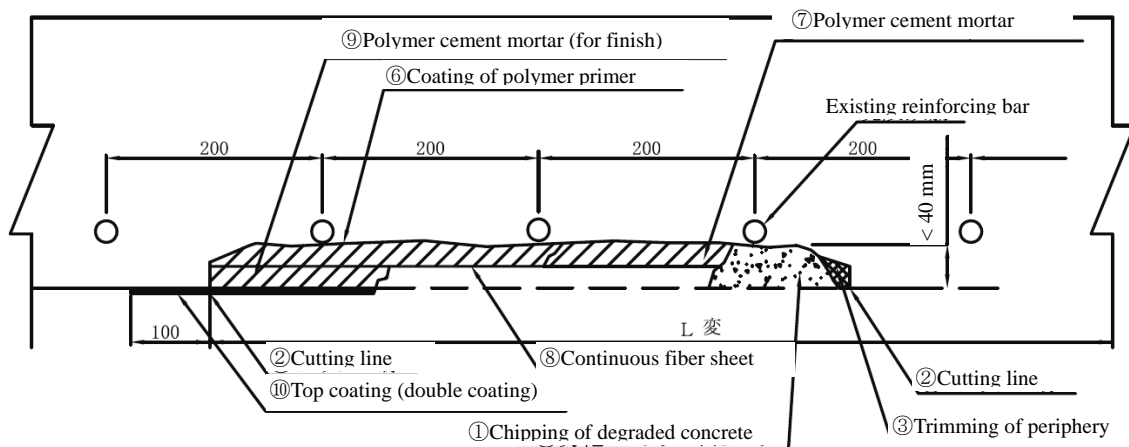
General Drawing of Repair of Elevated Concrete Bridge
